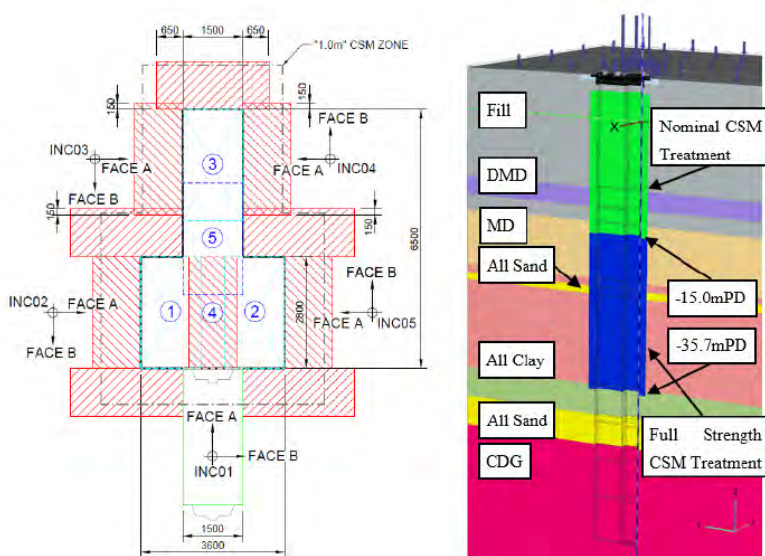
Y-Panel diaphragm wall excavation sequence and CSM ground treatment on plan and section views
